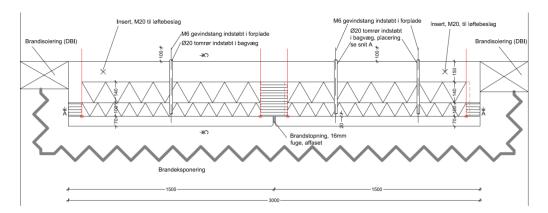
Horizontal section in the test specimen. From below: Outer leaves (2pcs.), edge and main insulation, supporting concrete wall. Left and right edge corresponds to window- or door-reveals with edge insulation. No window or doorframe is mounted.
